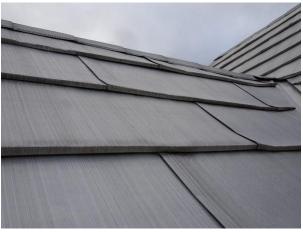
Detail of pressed sheet-metal roofing with grooved pattern, giving the appearance of a wood shingle.
